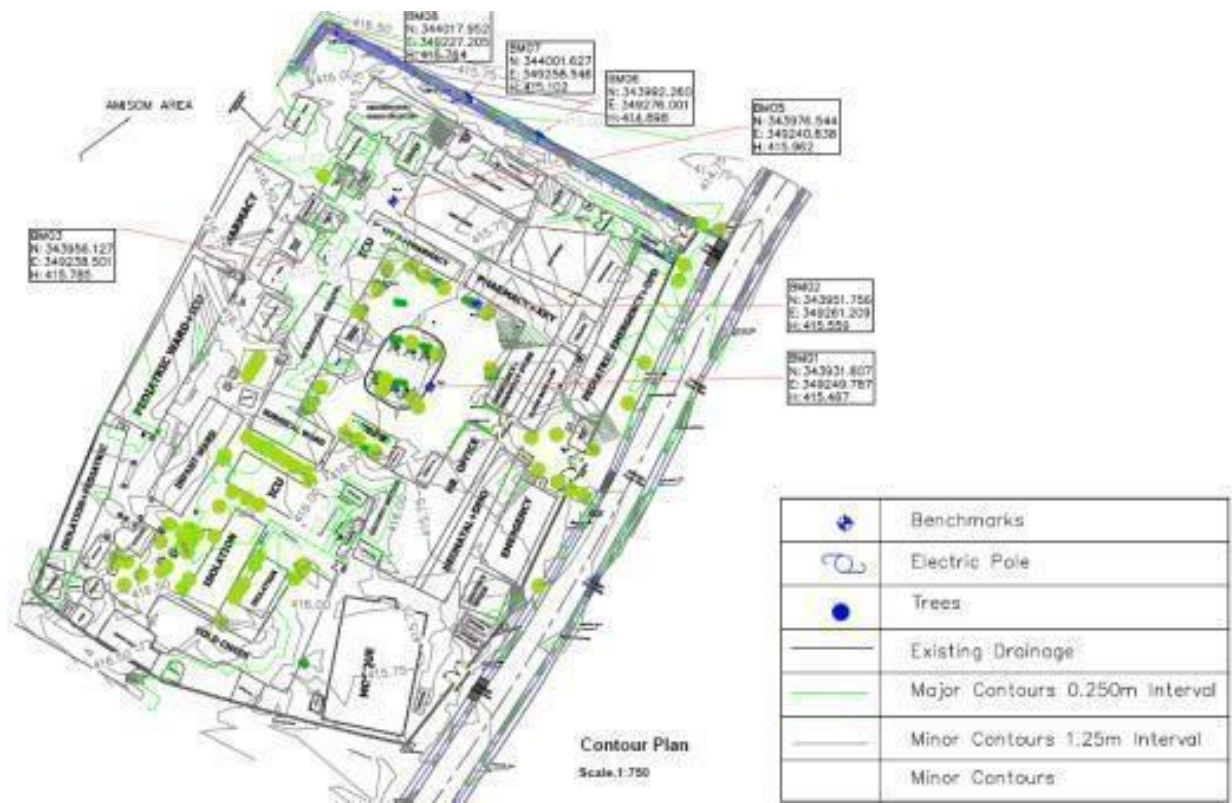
Layout plan of the Facilities at Bay Regional Hospital in Baidoa
